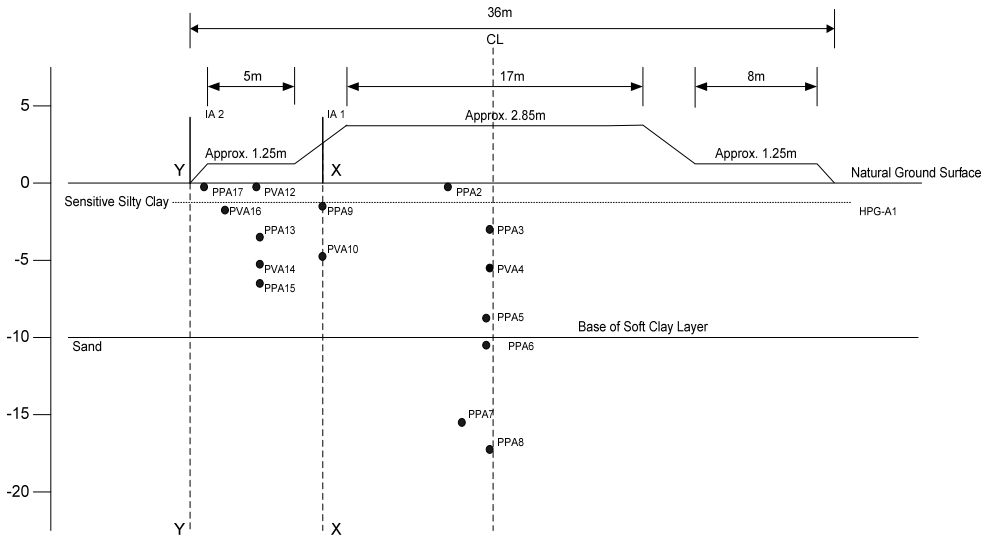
Cross section showing instrumentation layout plan for Section A (PVD at 1m spacing)
